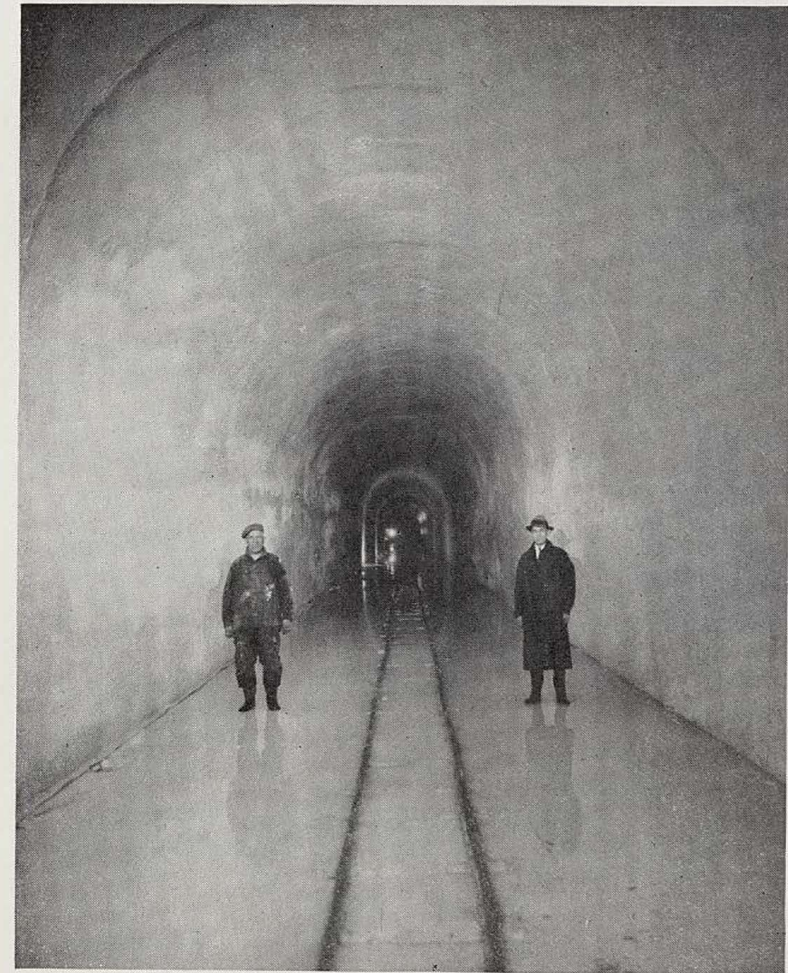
Sixteen-foot completed section—Chicago Avenue Tunnel
